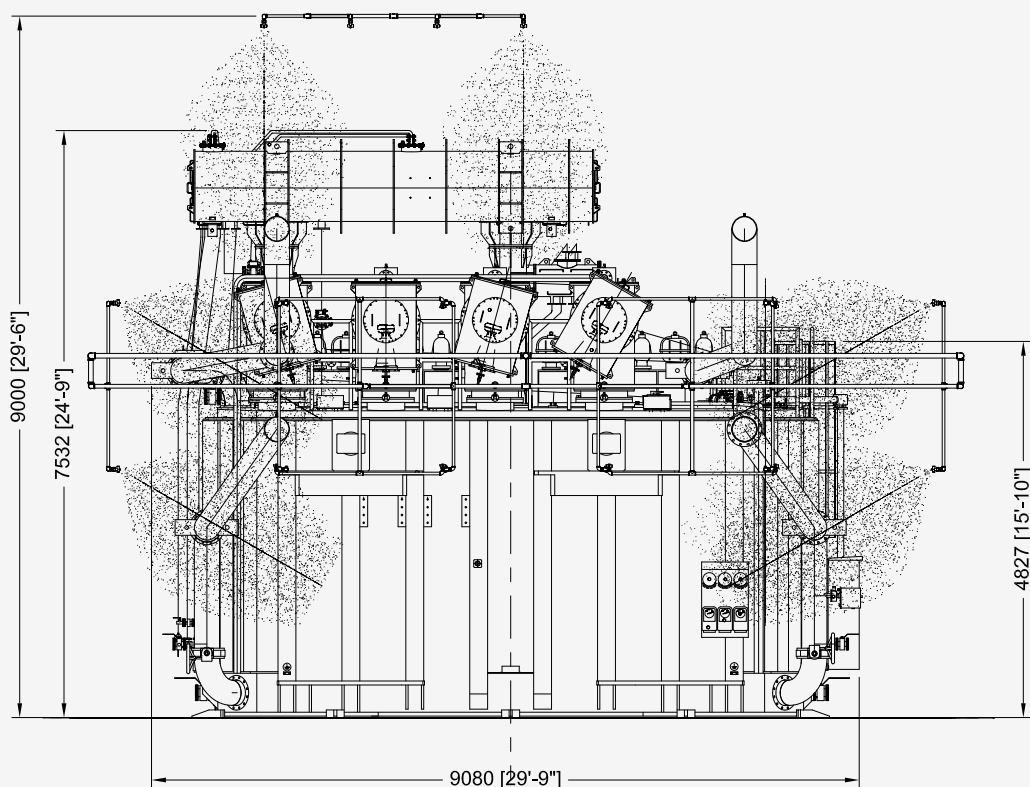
FRONT VIEW NOZZLE LAYOUT
